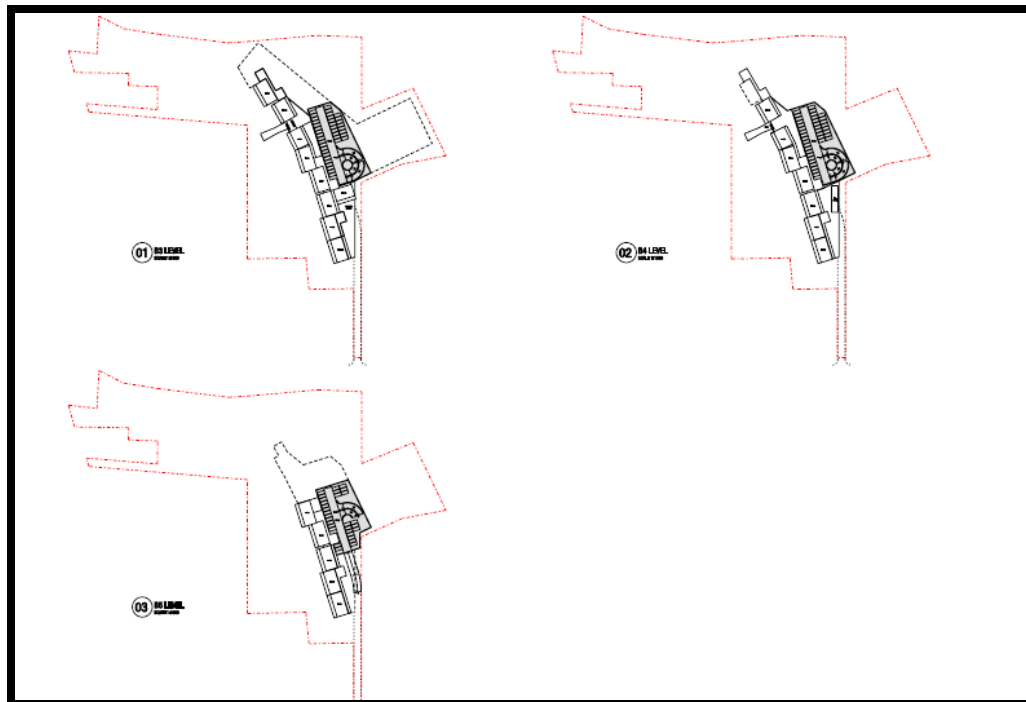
Indicative Carpark Levels B3 – B5. (Source: Ancher Mortlock Woolley, 2009)
